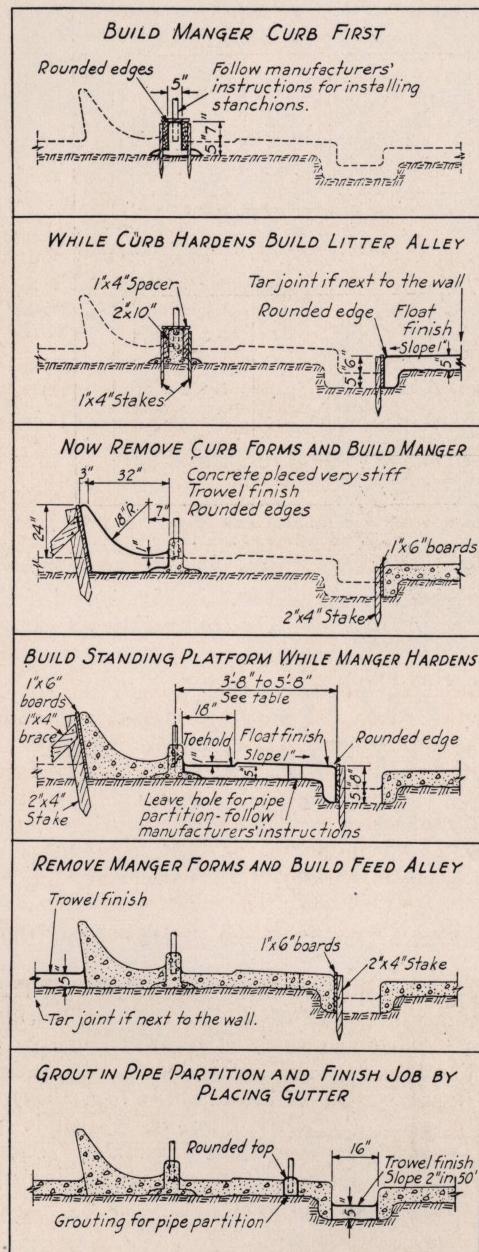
Showing, from top to bottom, the six steps required in building a concrete floor for the dairy barn
